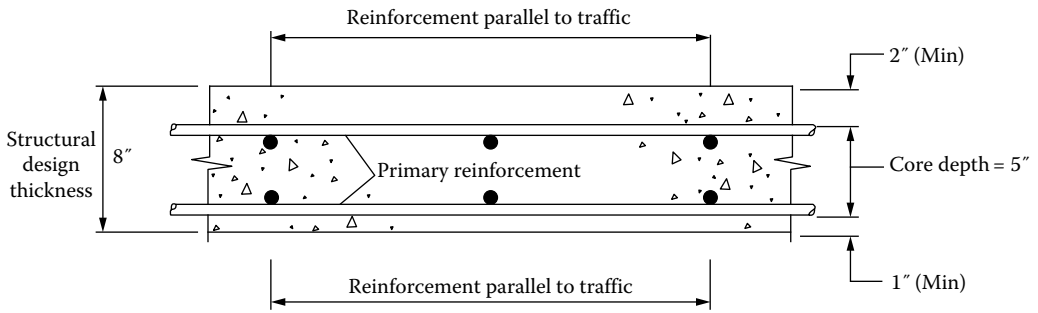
Core of a concrete slab (segment of transversely spanning deck shown). The core thickness is the distance between the outer surfaces of the reinforcing bars closest to the top and bottom surfaces of the slab.
